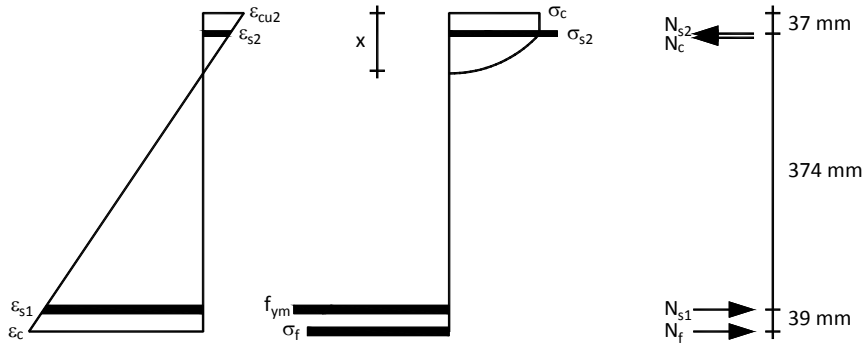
Cross-section analyses of the strengthened beam at concrete compressive failure
